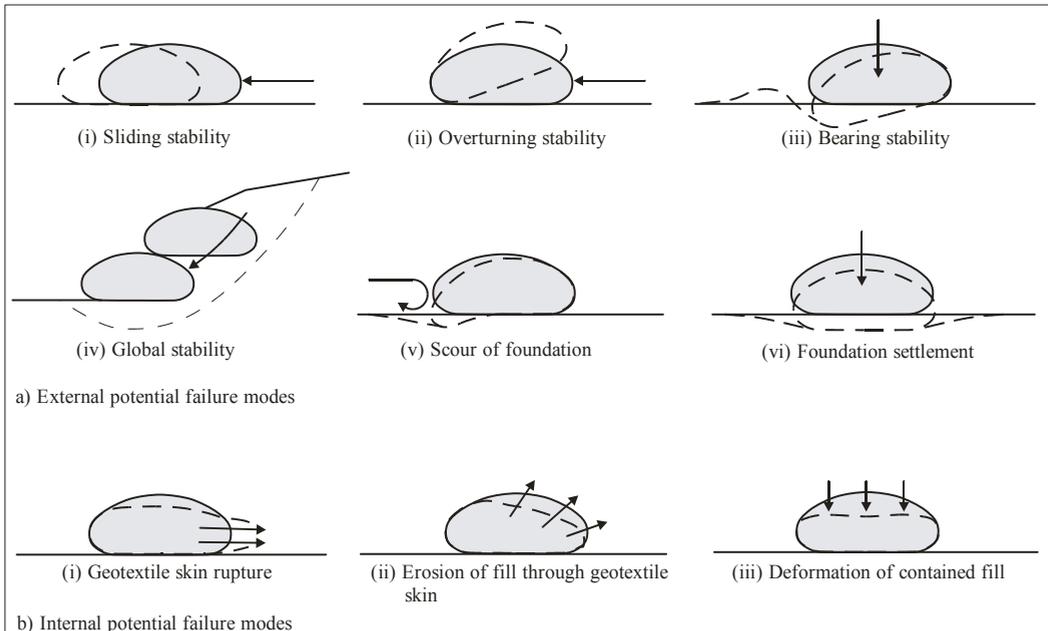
Potential failure modes for geotextile tubes (Lawson 2008, 2006)
